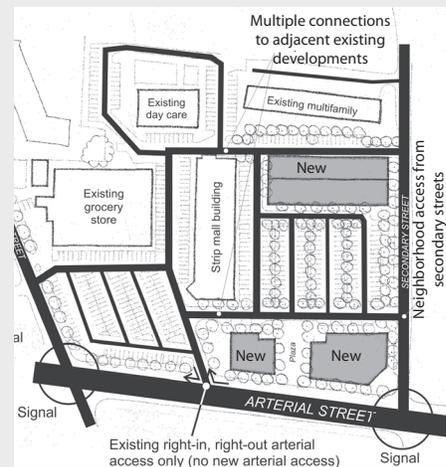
The redevelopment scenario above provides multiple internal pedestrian and vehicular connections to the existing commercial development adjacent, while also meeting design goals emphasizing buildings sited and oriented closer to the street.
